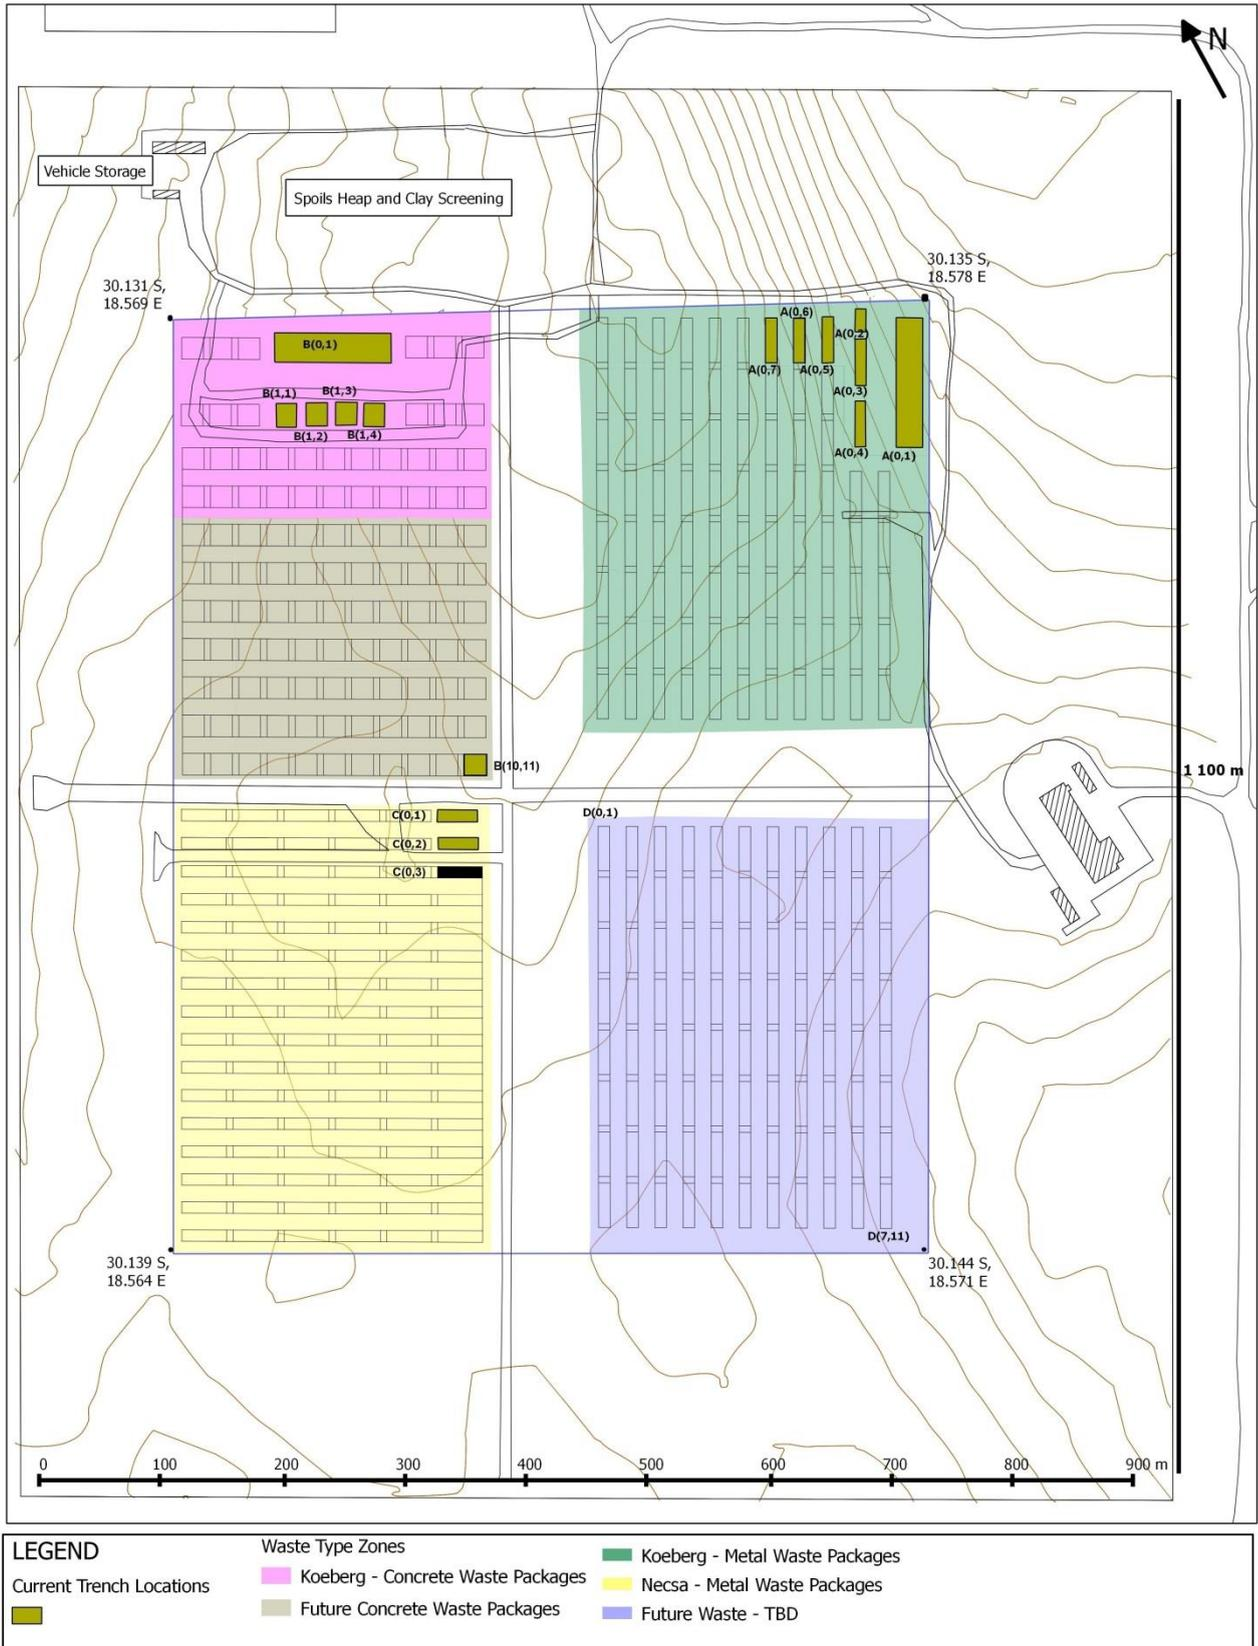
Layout plan of future trenches for LILW at the Vaalputs Facility
